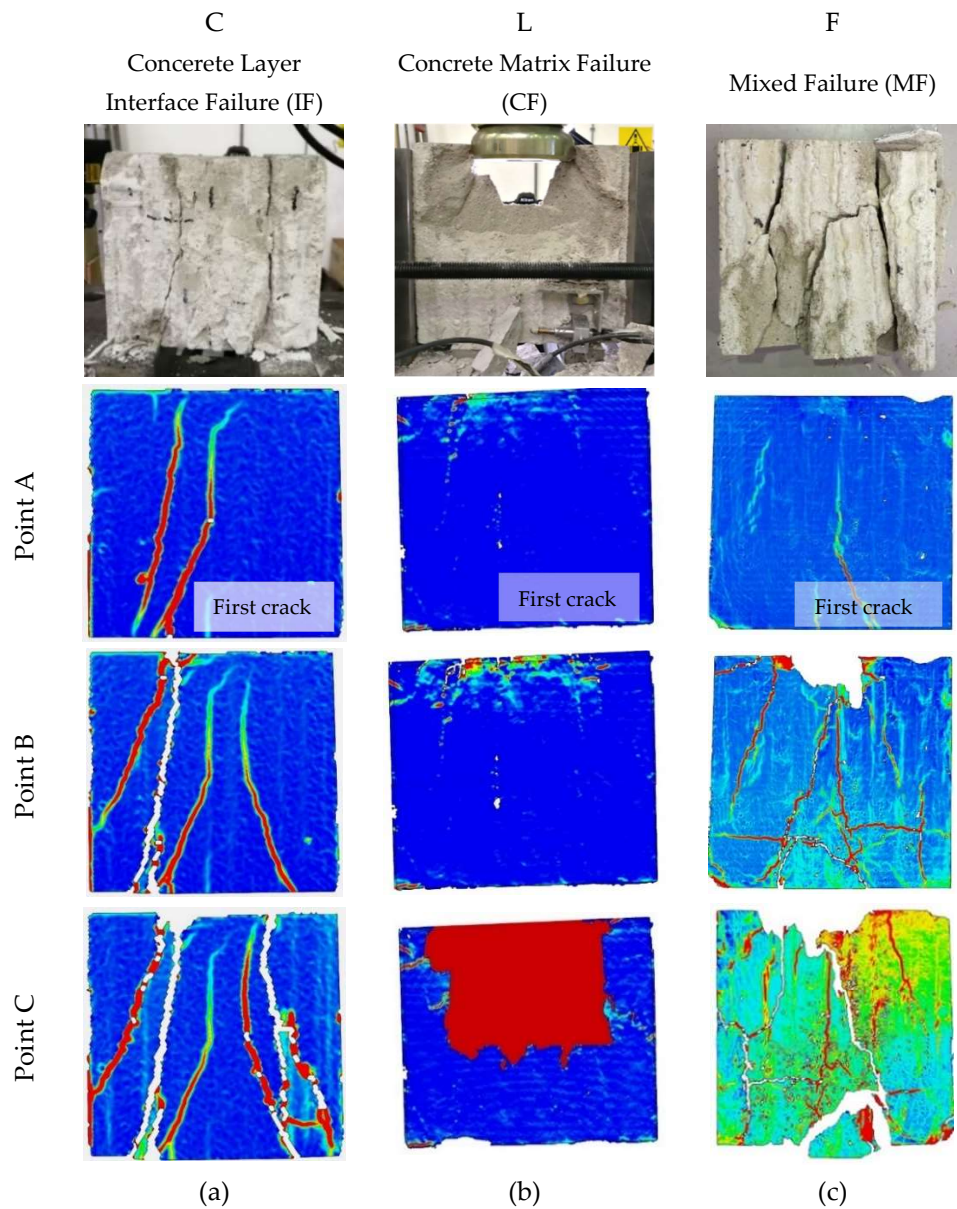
Crack pattern of the tested specimen: (a) concrete layer interface failure, (b) concrete matrix failure, and (c) mixed failure.
